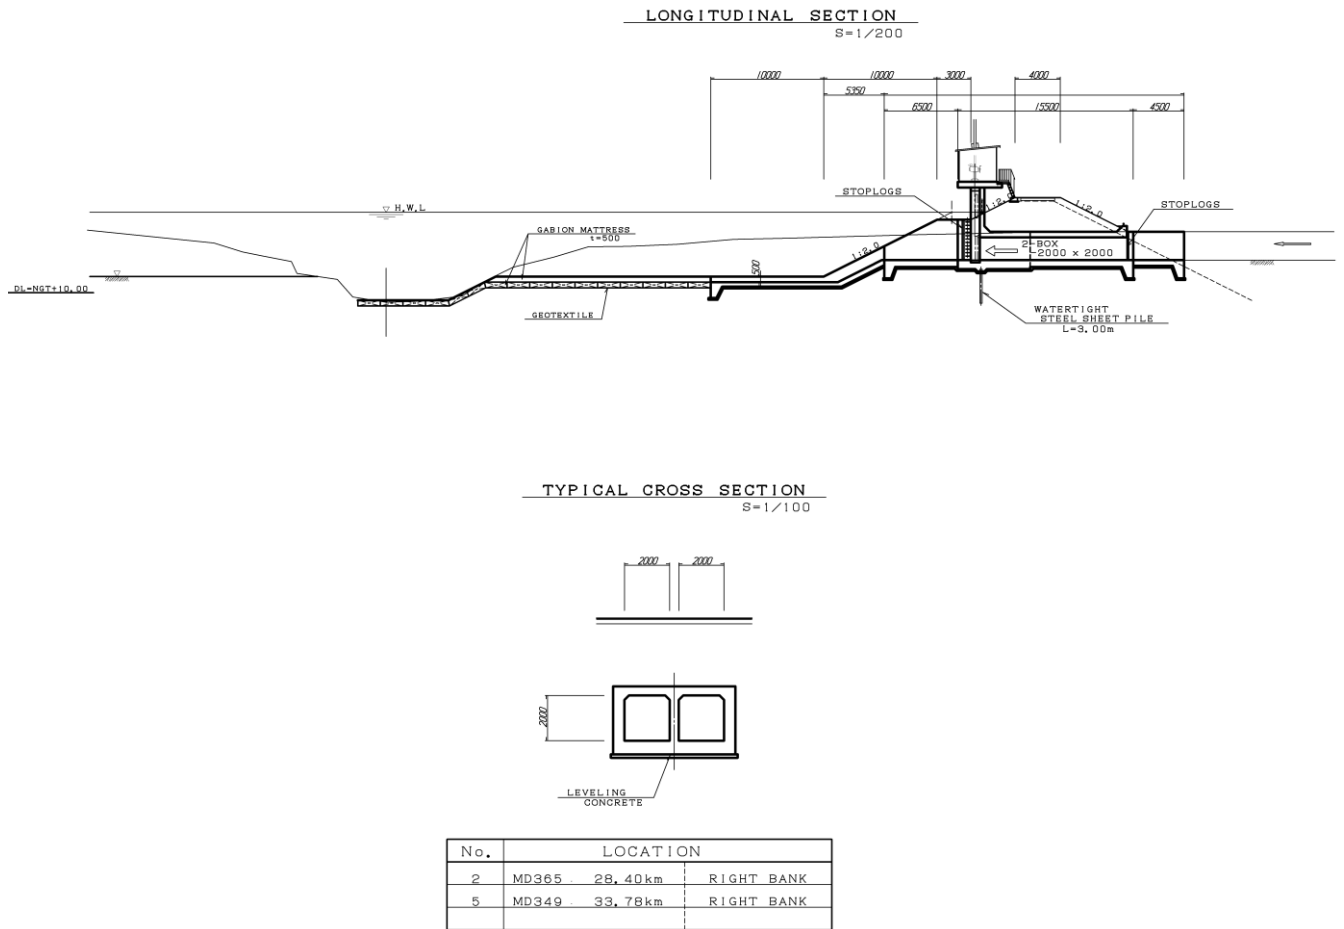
Typical Structure of Rebuilt Sluiceway
